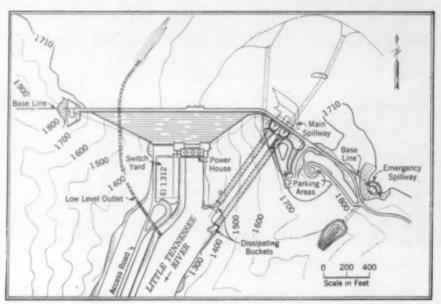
General Plan of Fontana Dam, with Spillways in Abutment
